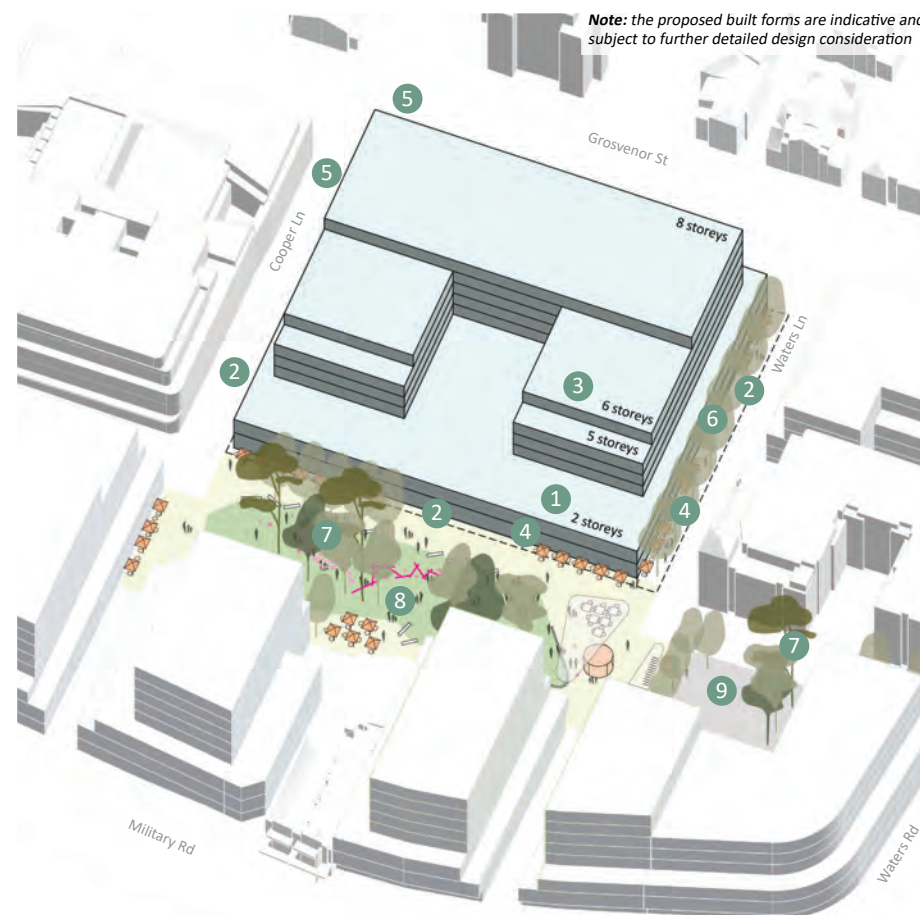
Illustrative Site 1 building envelope looking north-west
